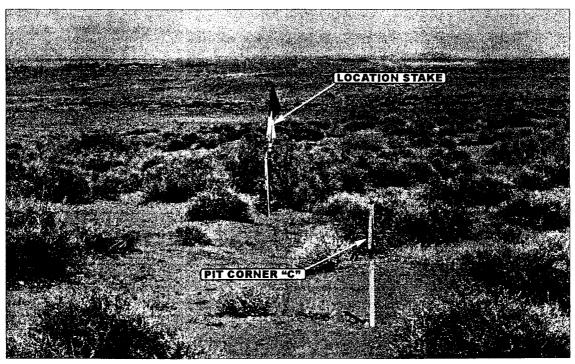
PHOTO: VIEW FROM PIT CORNER "C" TO LOCATION STAKE
